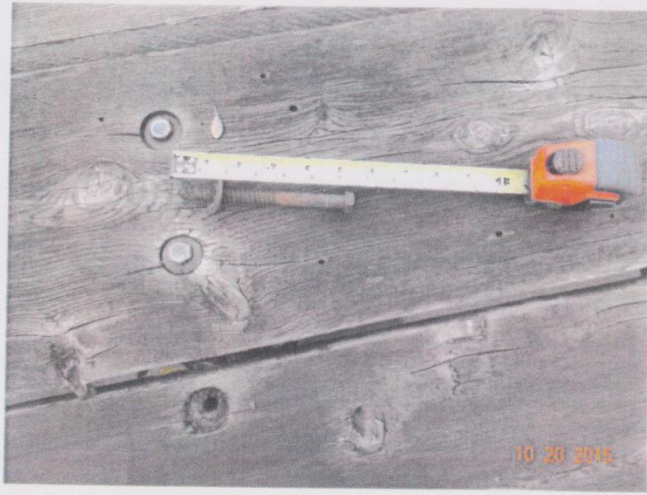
View of loose deck lag at Span #1. Timber nailers which hold the transverse planks in place are rotten and unable to securely hold lags.
